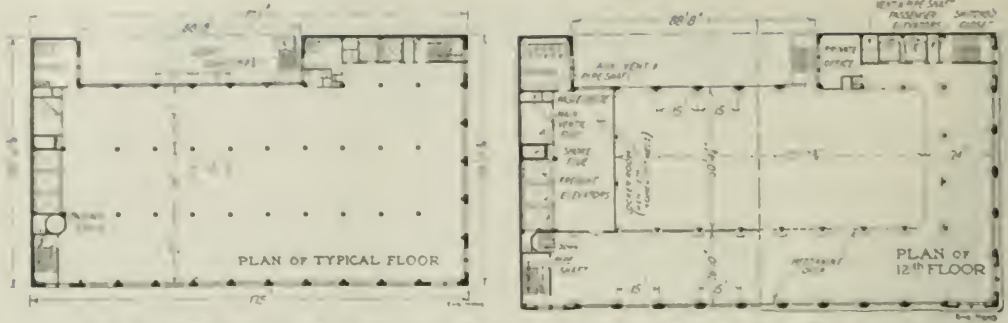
TWO FLOOR PLANS OF THE HILL BUILDING, SHOWING EFFICIENT SPACE UTILIZATION
